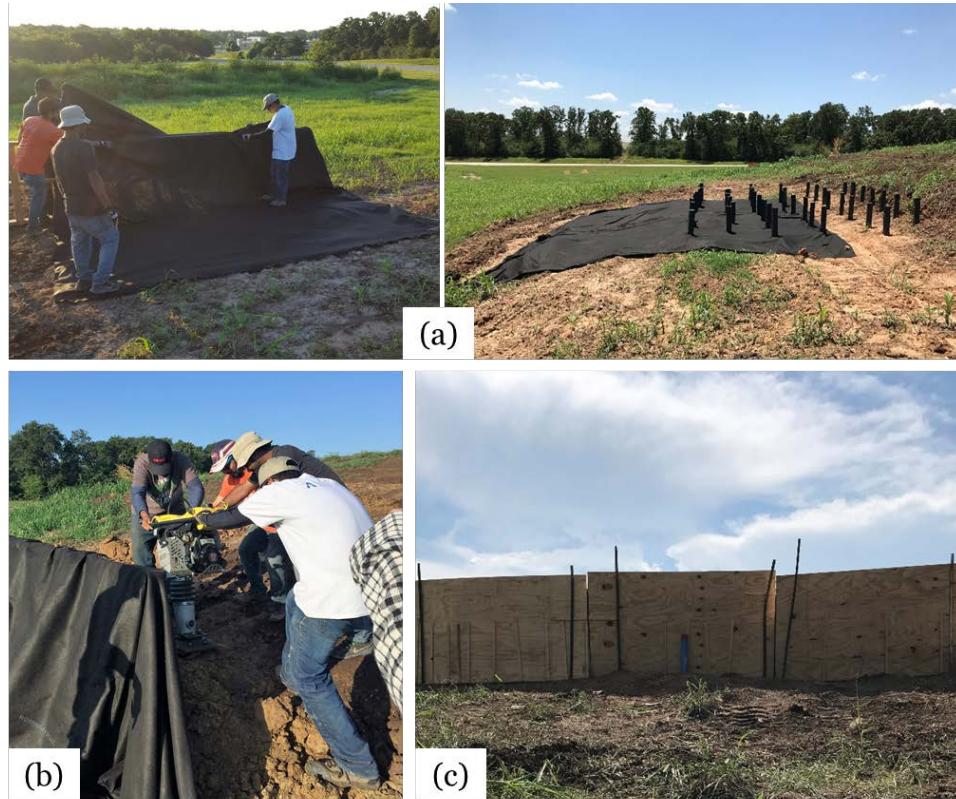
54 Construction of the test sections: (a) Placement of geosynthetic layer; (b) Compaction of soil layer; (c) Completed wall.
